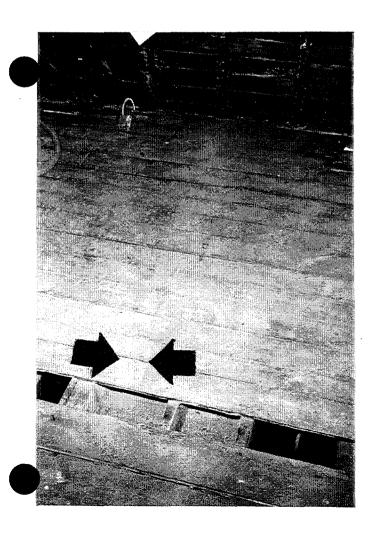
GHOST-ED WALL LOCATION AT FLOOR OF ROOM 103
